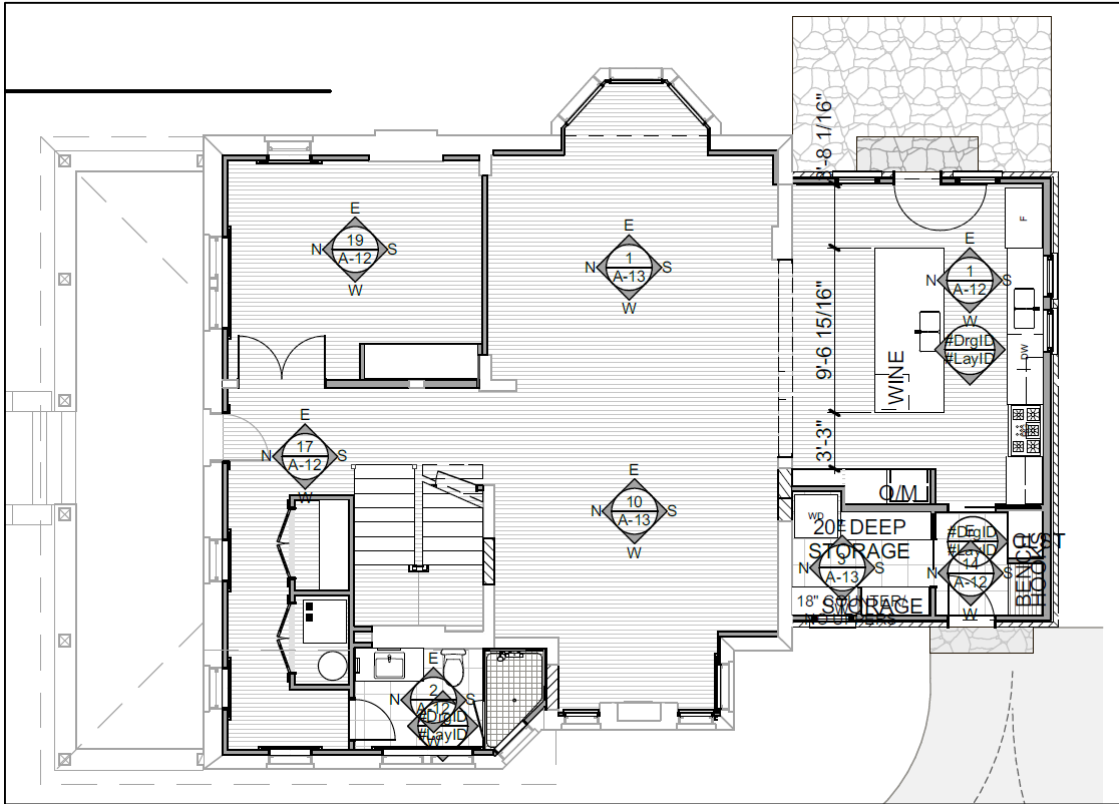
First floor, current plan. *Source:* Dodd-Studio, Boulder, CO. courtesy of David Secunda.
